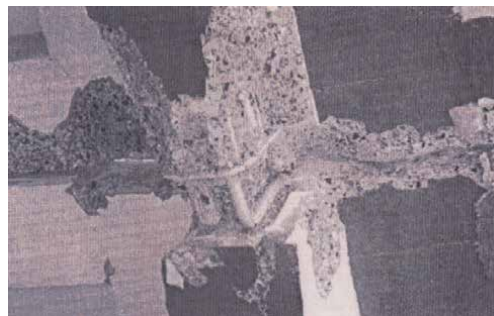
Concrete easily separates from epoxy coated rebars under vibratory loading conditions whereas all structures are required to resist vibratory loads due to earthquakes; separation led to failure of buildings.
